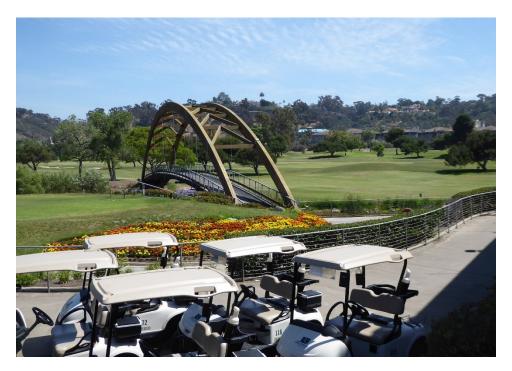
Access to golf carts is on the eastern portion of the building where the first of two major bridges provides a beautiful backdrop. Photograph taken facing southeast.
